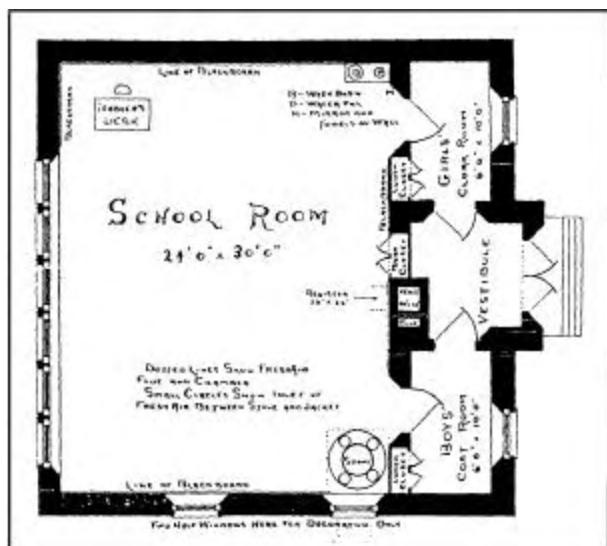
1909 Floor Plan No. 1 for a one-room adobe (school) building.
